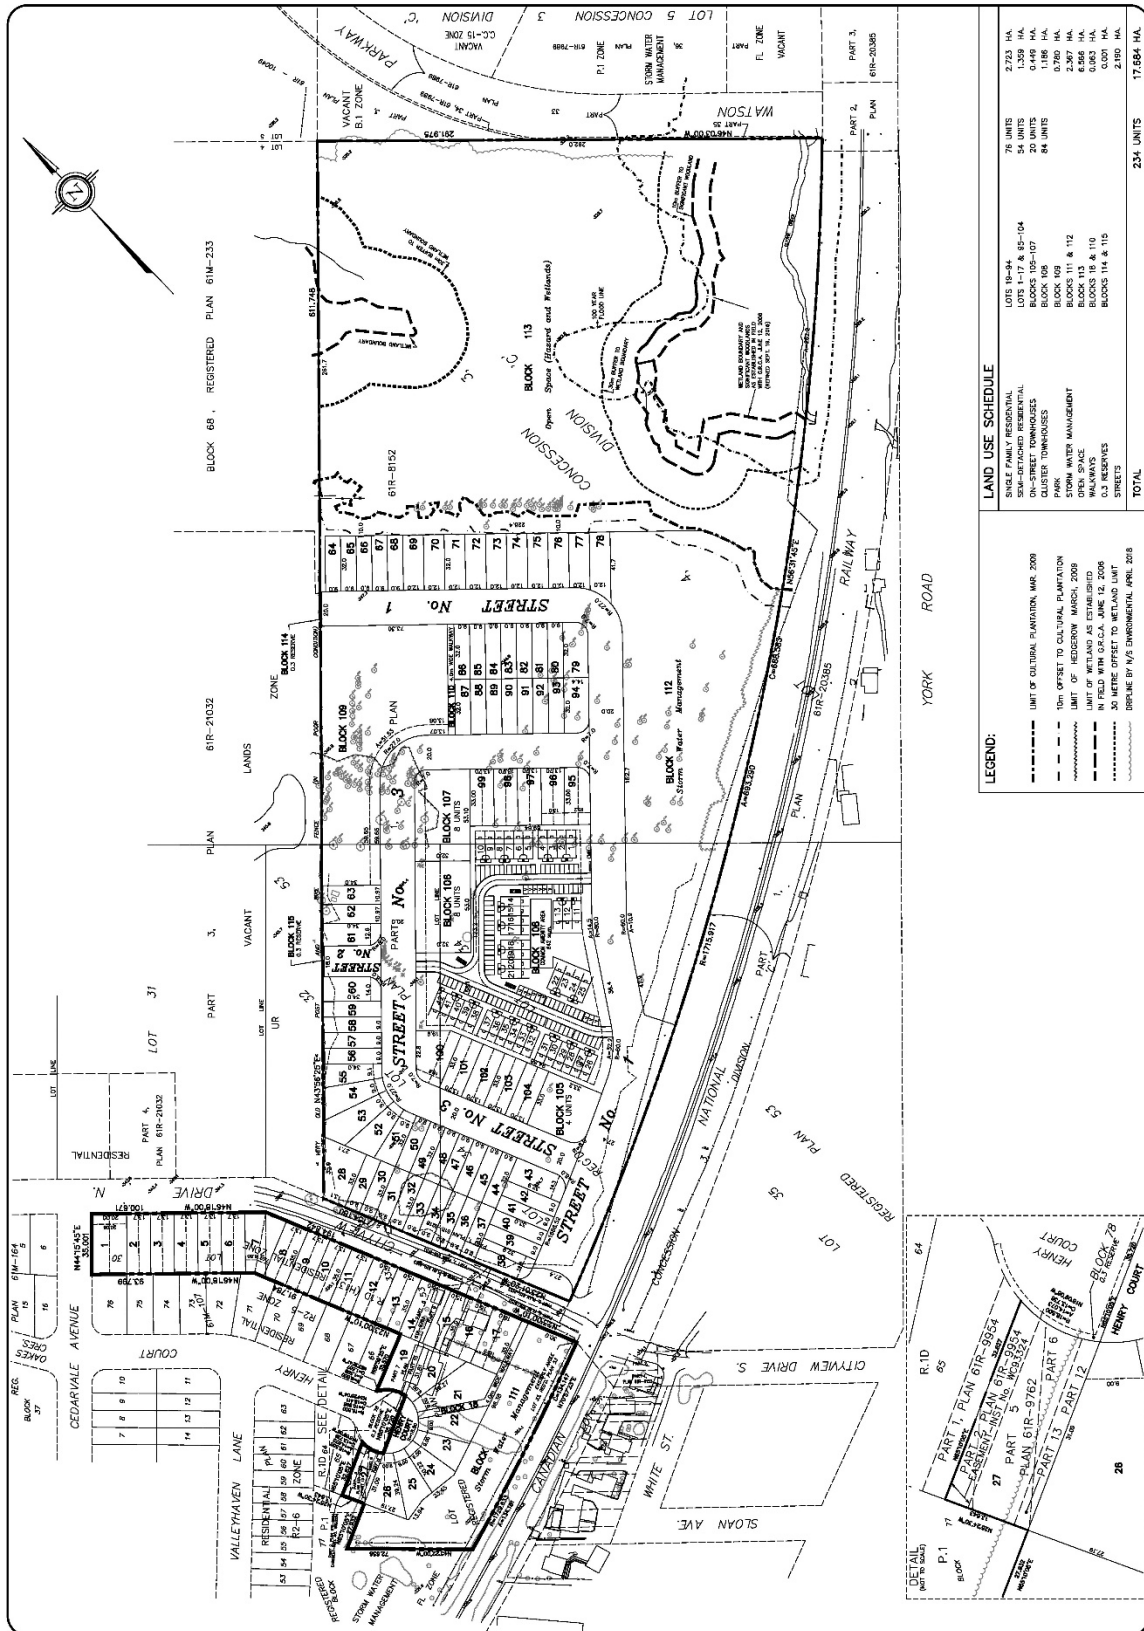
Proposed site development concept (Source: BSR&D / JD Barnes)
